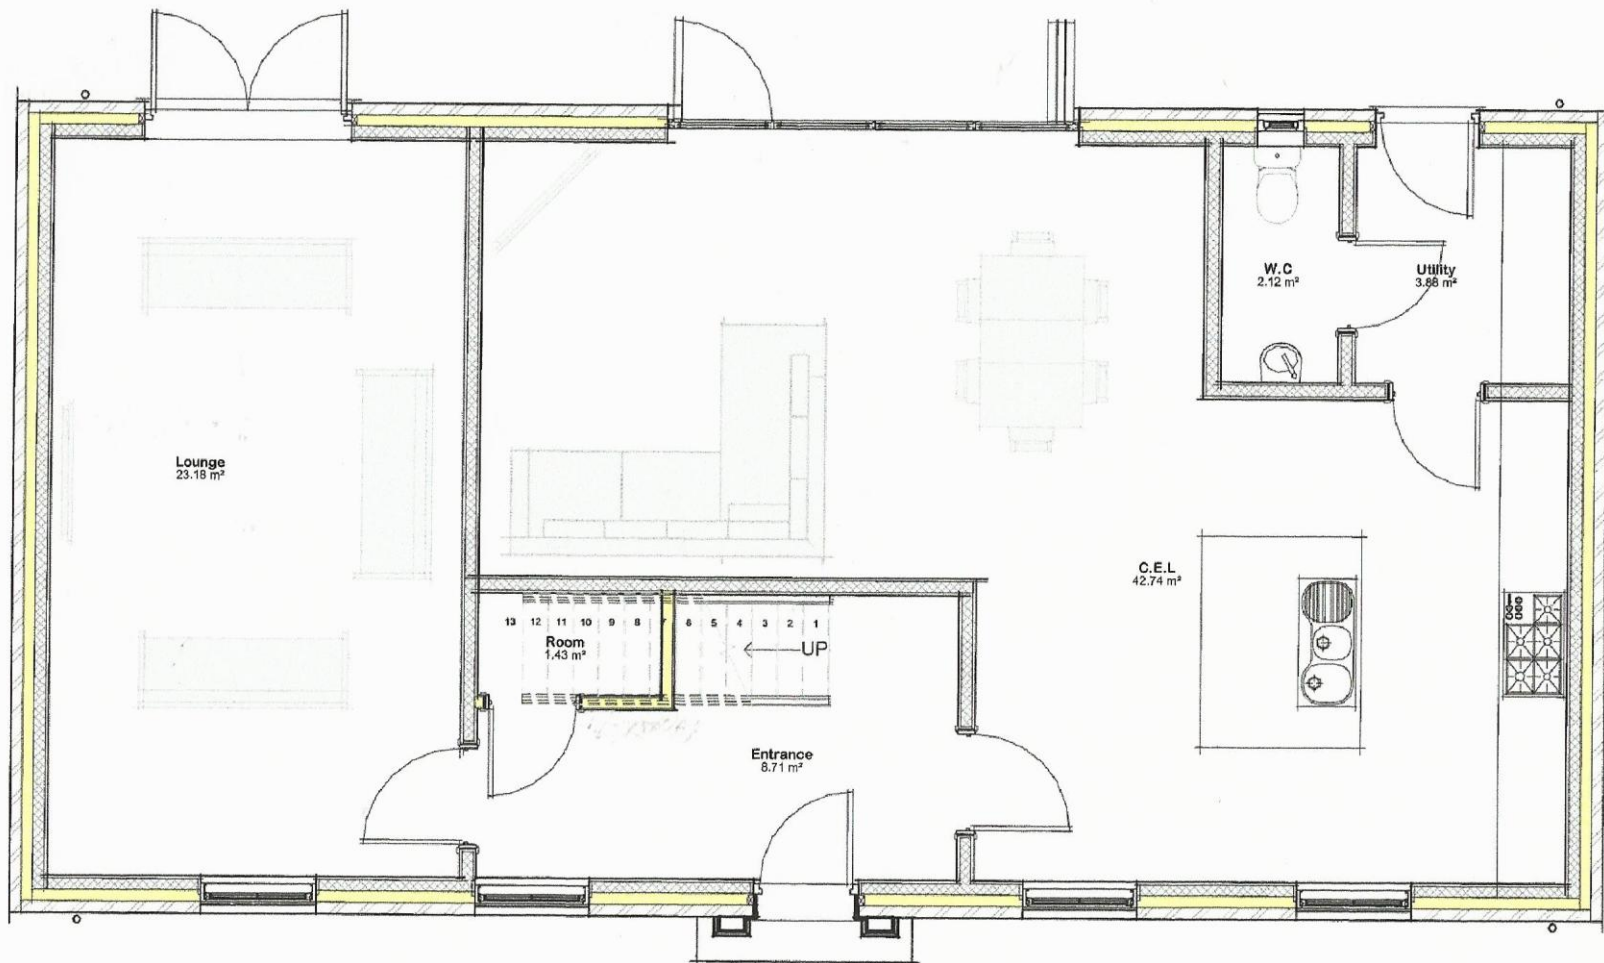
Plan showing the proposed ground floor layout of the new replacement dwelling at an original sale of 1:50 at A3, (not to scale), (extract from Architects plan)
